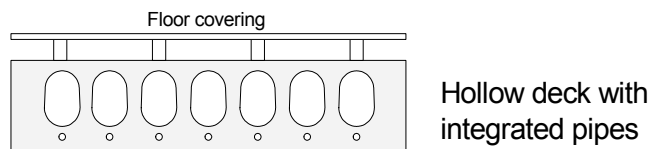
shows the type of thermo active component which is typically used in buildings in Central Europe where the system is installed. The pipes are normally placed in the lower half of the deck towards the ceiling surface. Between the concrete and the floor surface there might be a layer of insulation to ensure that the heat flows in the construction will be directed downwards and prevent noise distribution between the storeys. The vertical placement of the pipes is ensured by fixating to or hanging from the reinforcement in the deck.
